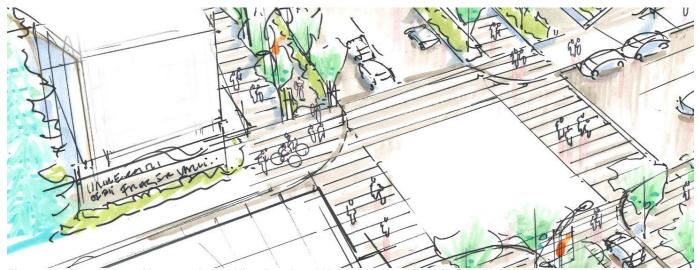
Rendering of Intersection at King Road and University Way (UWalk South)
